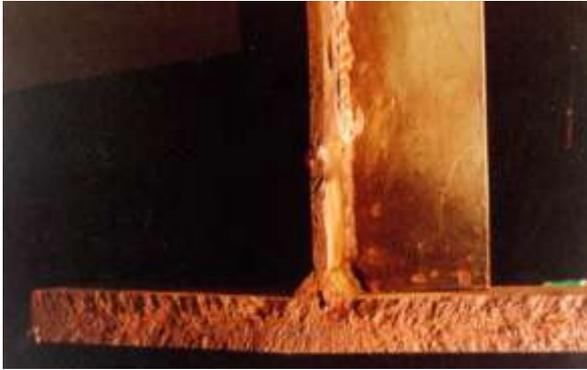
Girder flange fracture from Cherokee County, Iowa Bridge.
